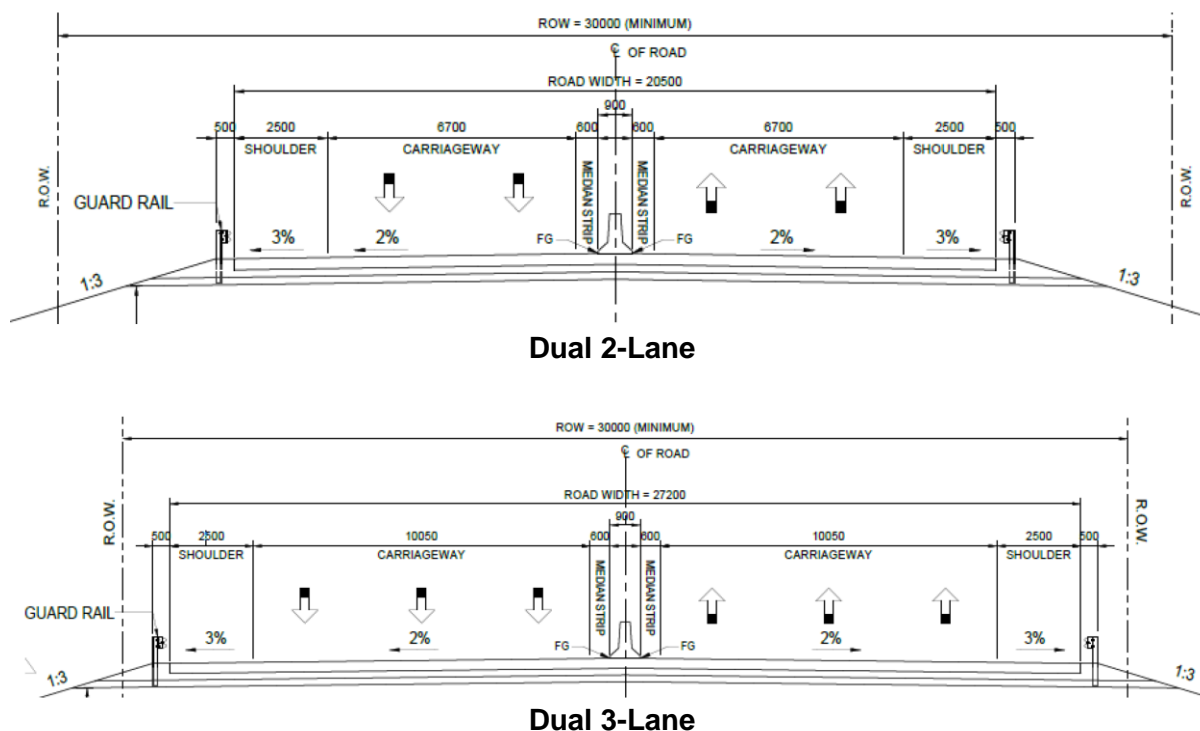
Typical Cross Section of Mainline Embankment Sections
